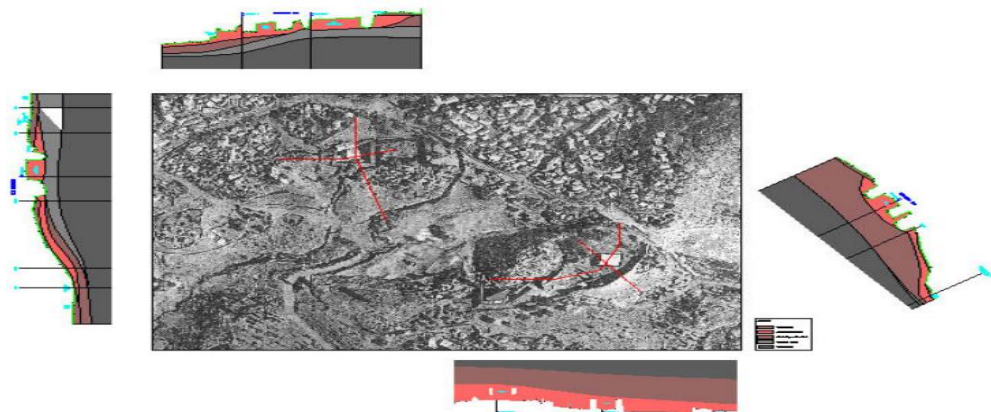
Geotechnical section of the Lalibela church sites with traces displayed over an aerial photograph. (Source: [7])
